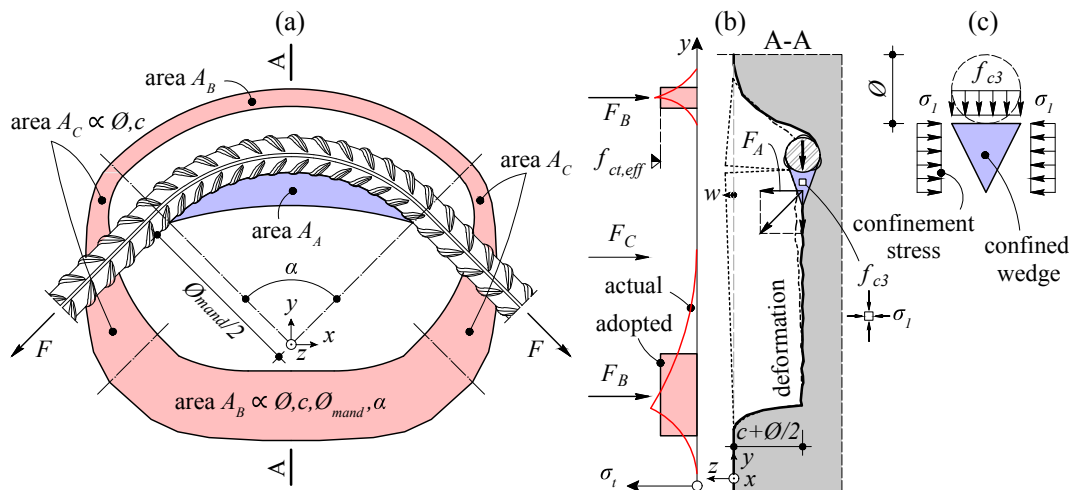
Mechanical model: (a) plan view with spalled areas and considered areas in tension; (b) detail of stresses and forces; and (c) detail of the concrete wedge with the confinement stresses.
